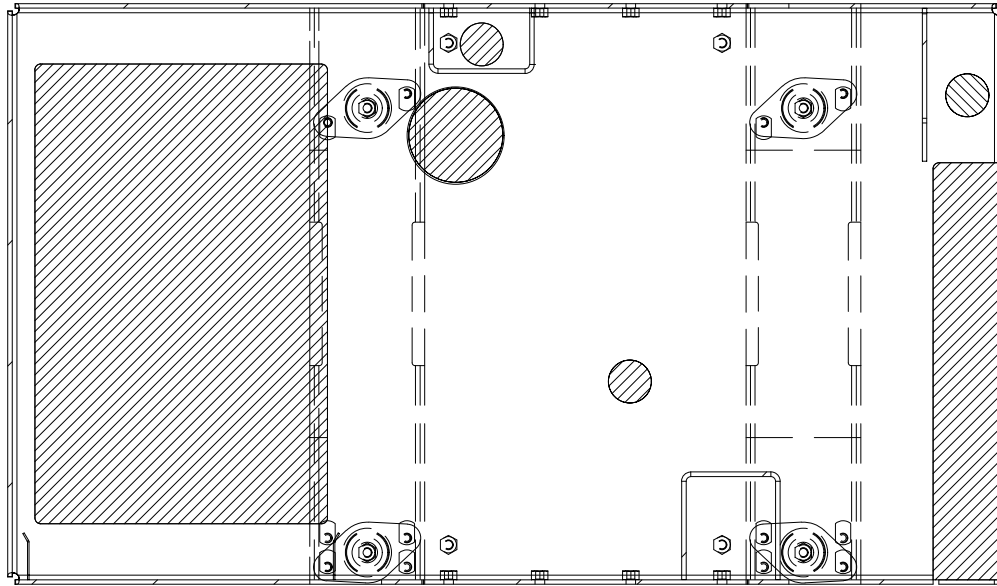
AIR INLET AND OUTLET OPENINGS IN BOTTOM (SHADED AREAS)
